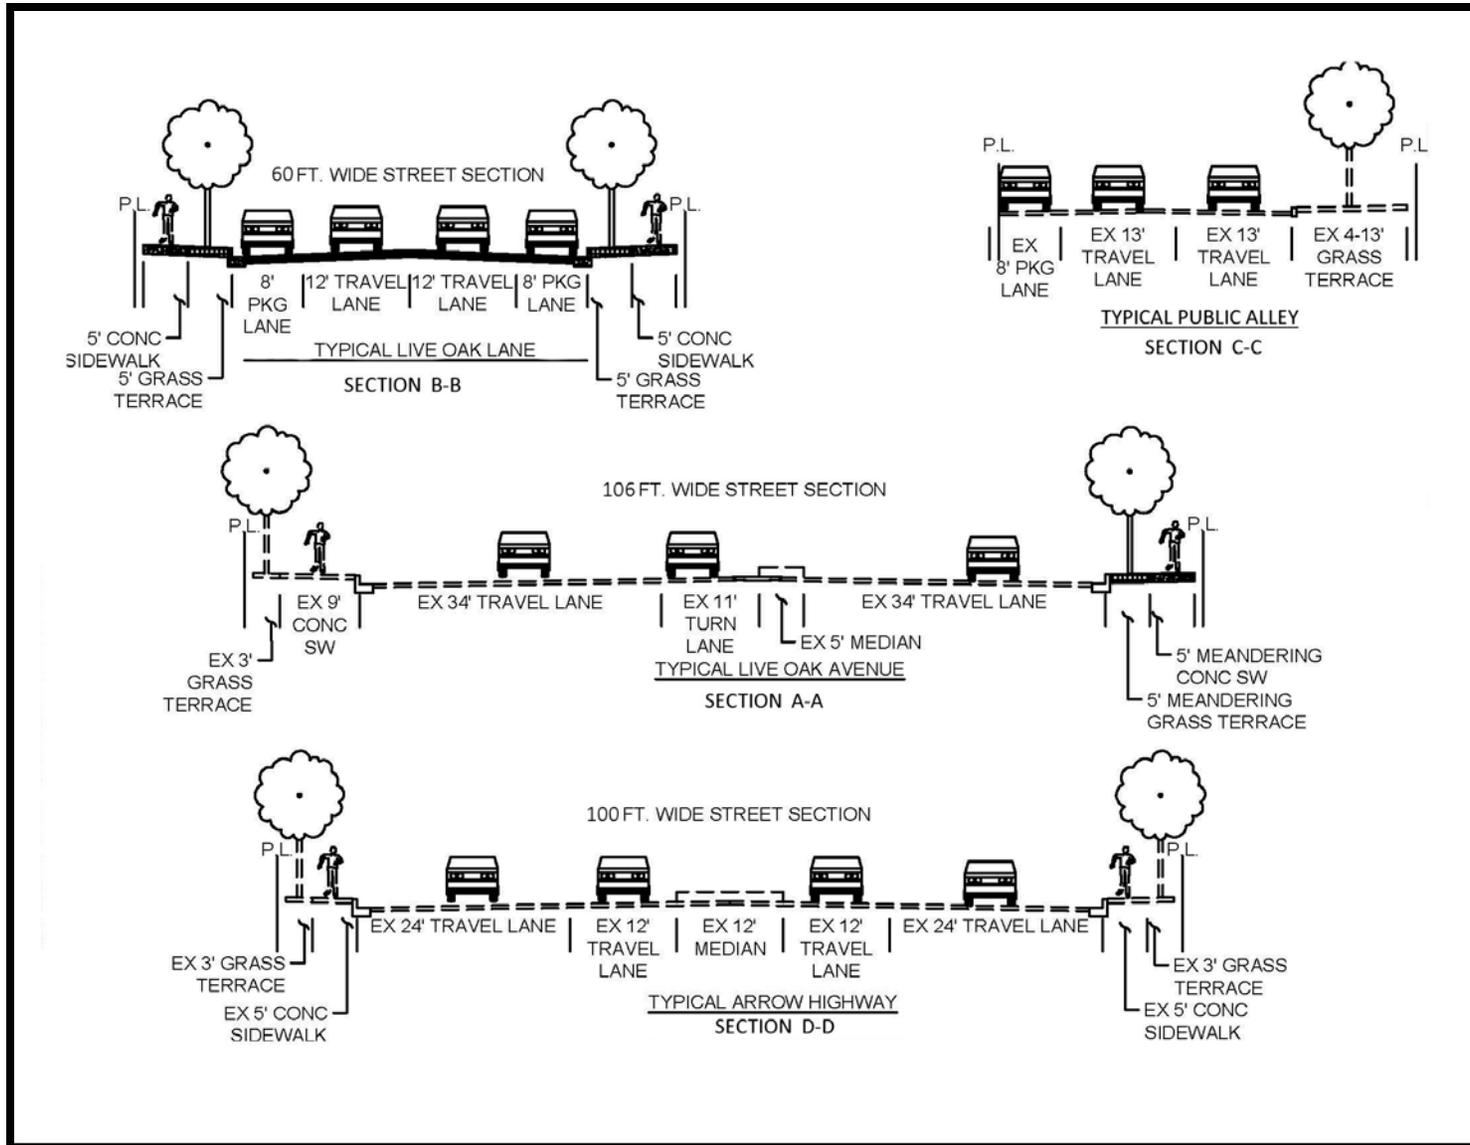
TYPICAL ROW CROSS-SECTION
